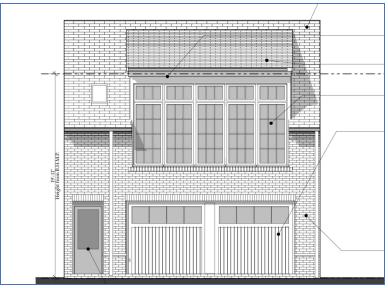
1258 Florida Ave Carriage House (Construction Pending 2020)
